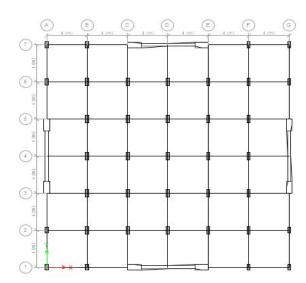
Model 6 (Building with shear wall having boundary elements with increased thickness)
